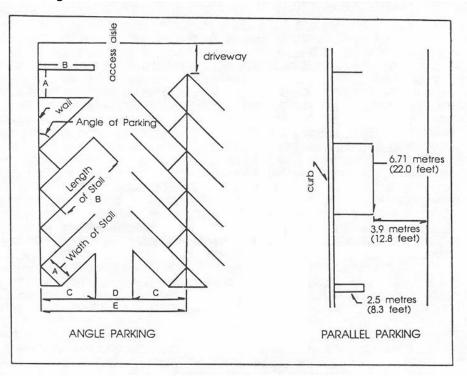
illustrates the parking space dimensions and requirements outlined in Subsections 4.1 and 4.3.
